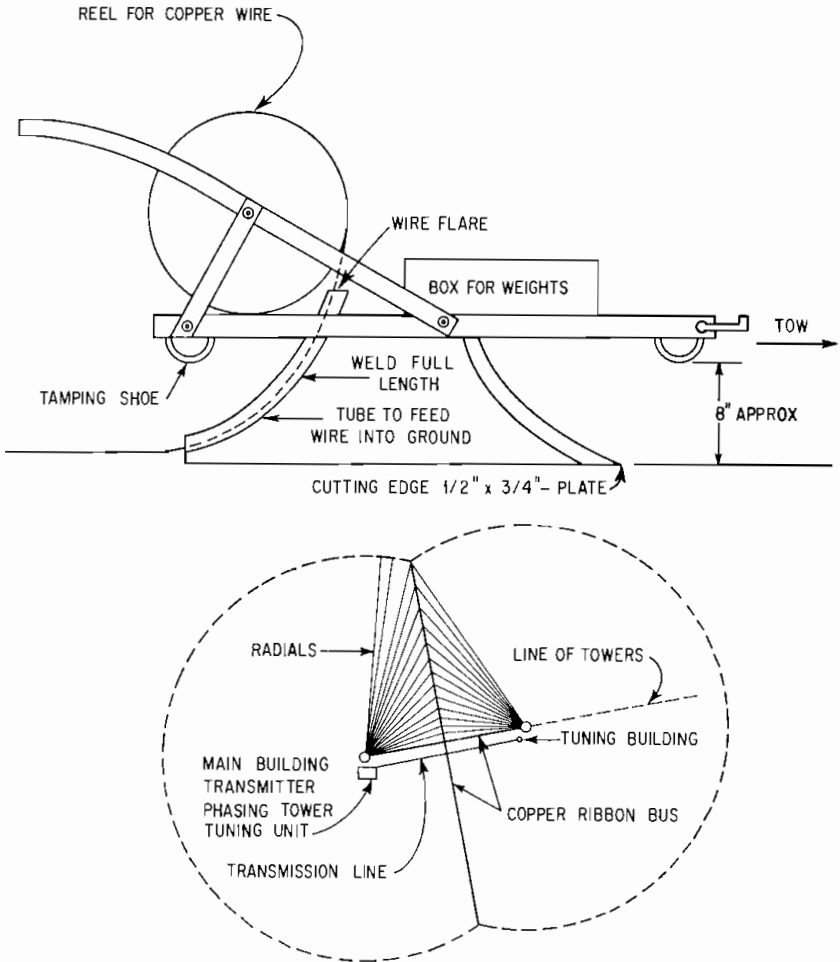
Design of plow for laying ground wires and typical two-tower ground system.
